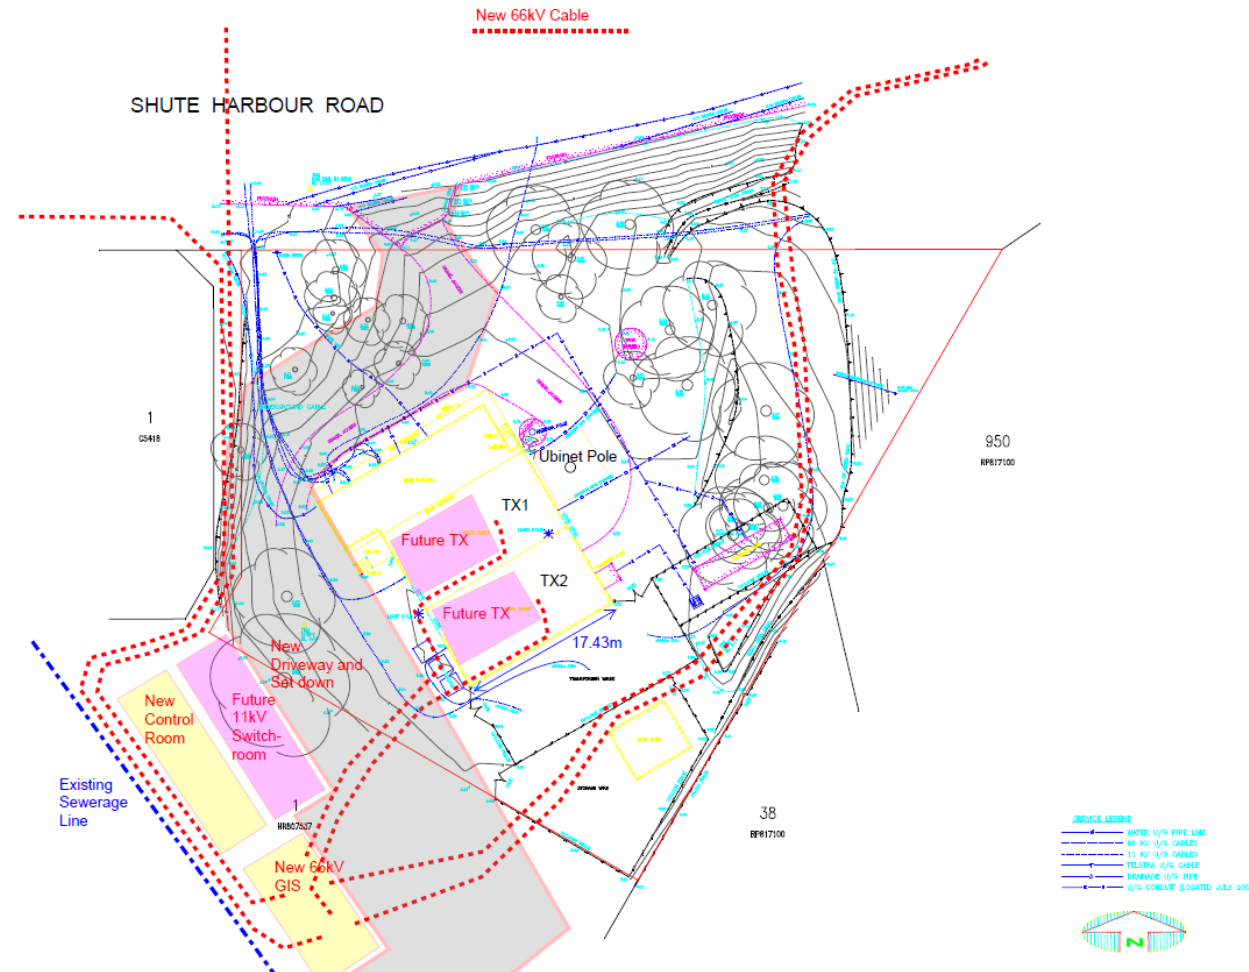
Proposed CANN Substation Layout with a GIS 66 kV Switchyard
